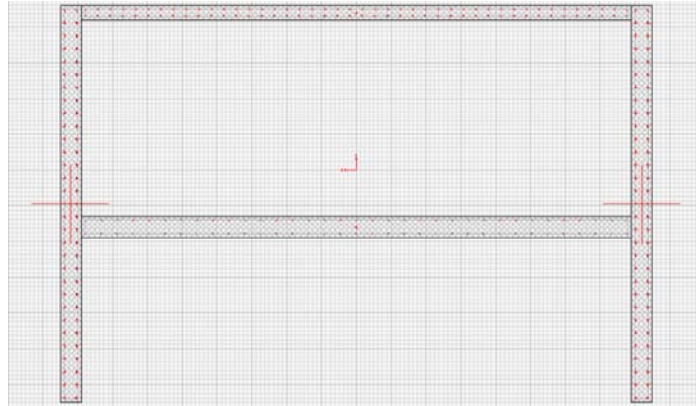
L3 - Section Designer Plan View of central bottom boxed core assembly
